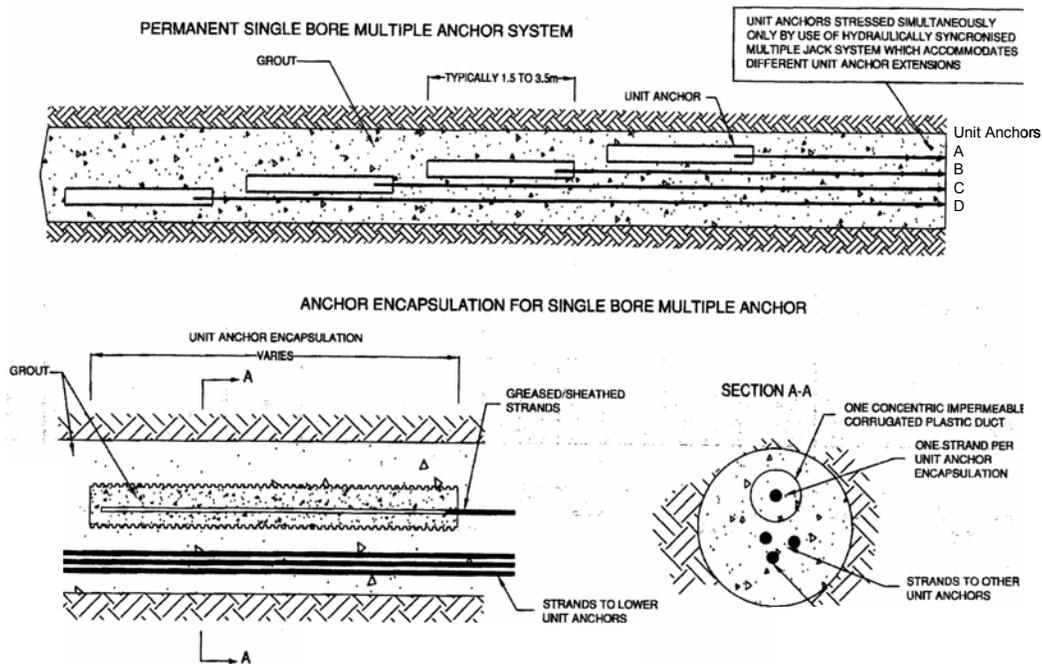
Elevations and cross section of a typical 4-unit SBMA.
